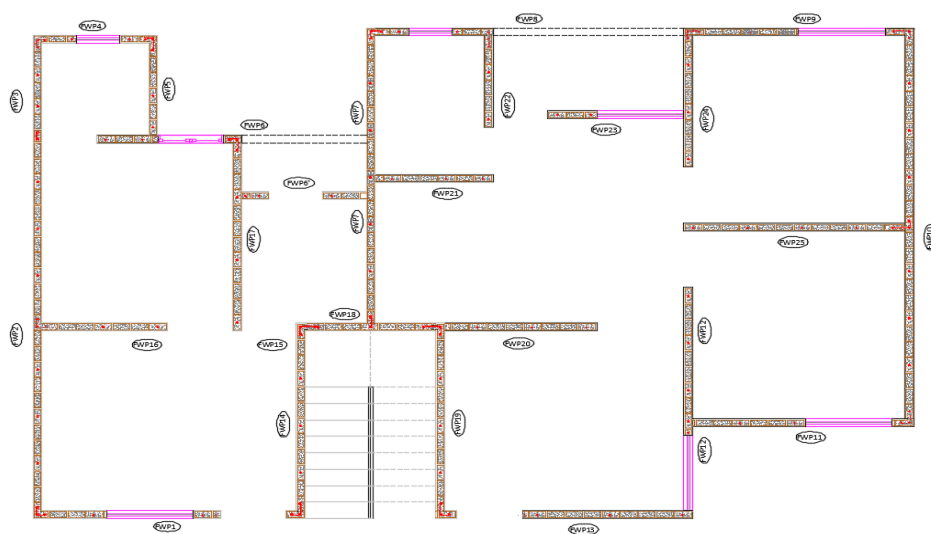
Typical floor plan of a GFRG building showing wall panel notations
